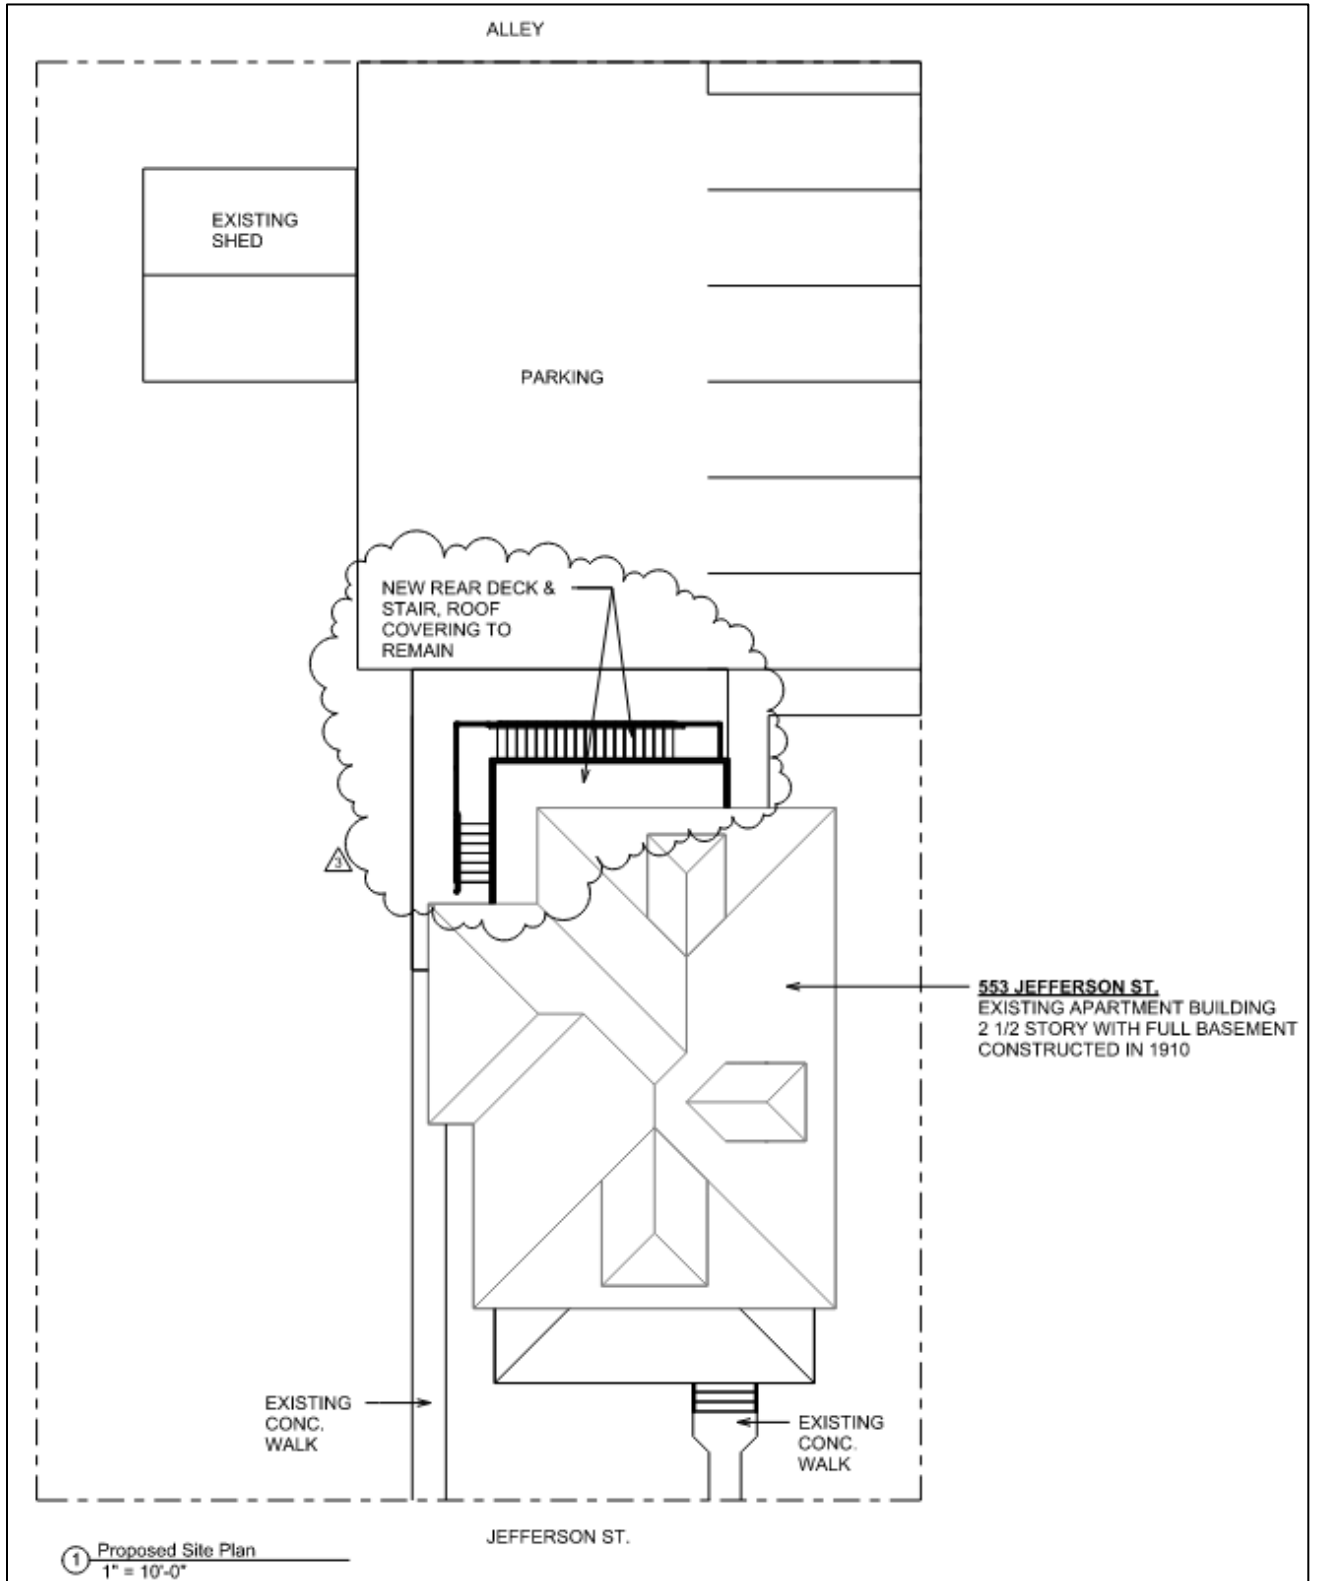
Proposed site plan featuring new rear two-tier porch and stairs.
